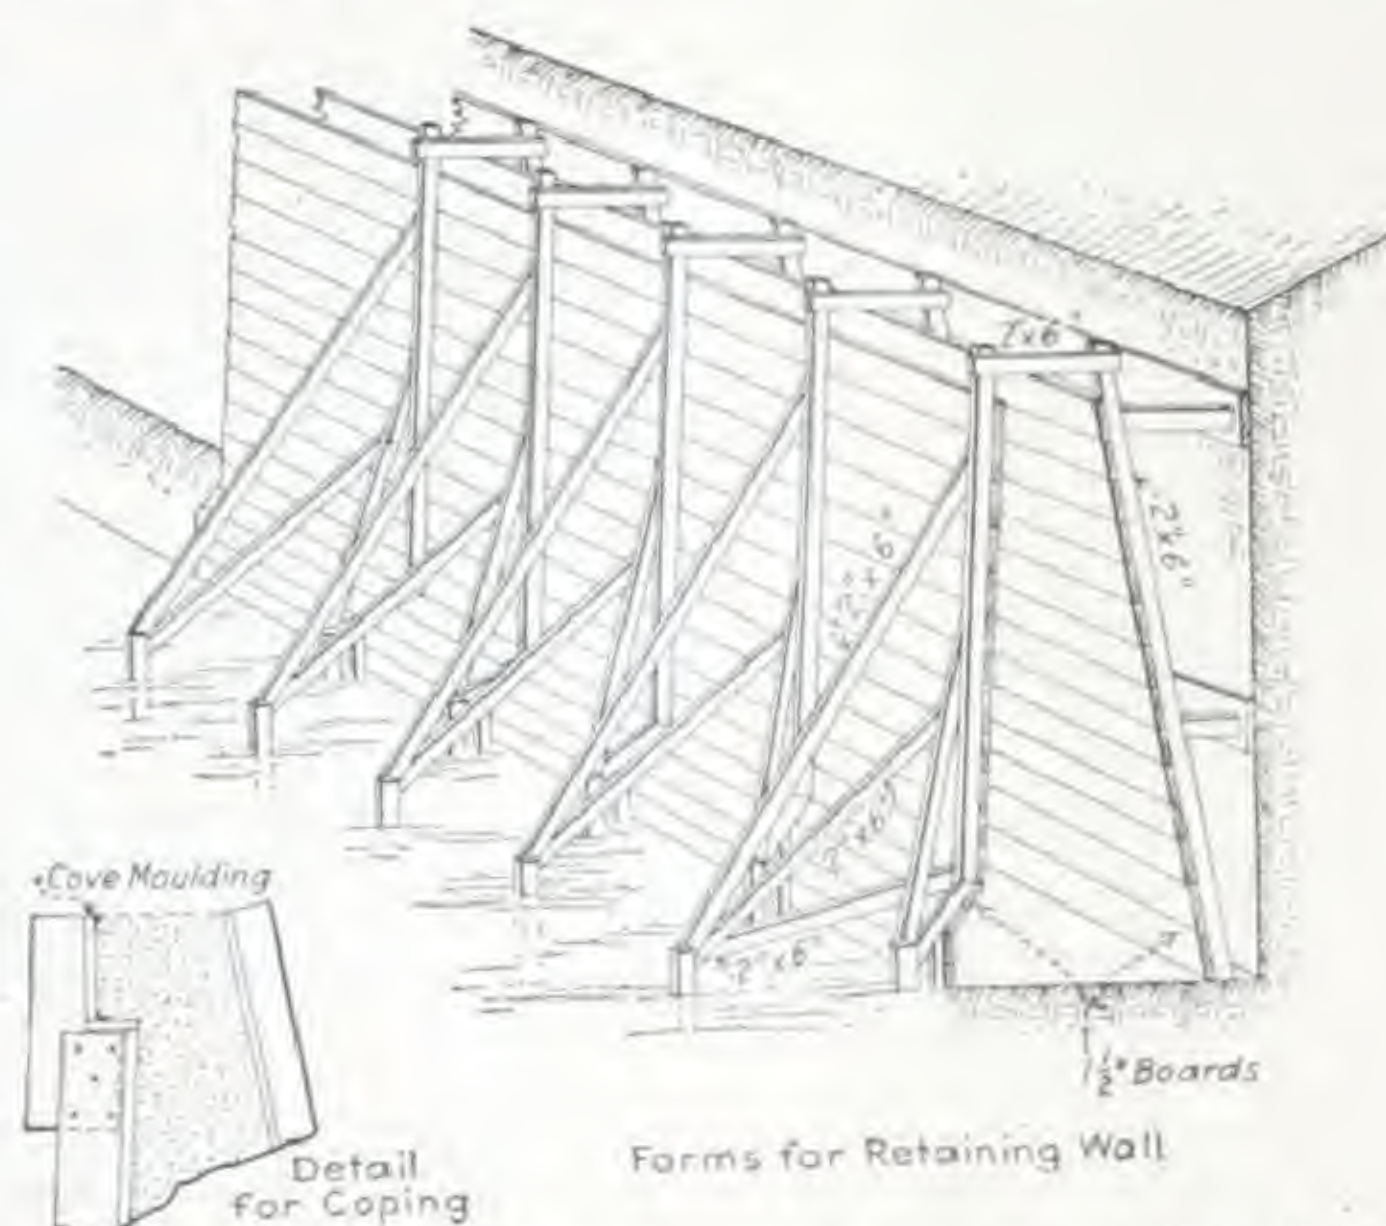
Forms for retaining wall. Space back of the form (to the right) to be filled in after wall is completed. To the left, below, form for a top molding or coping.
